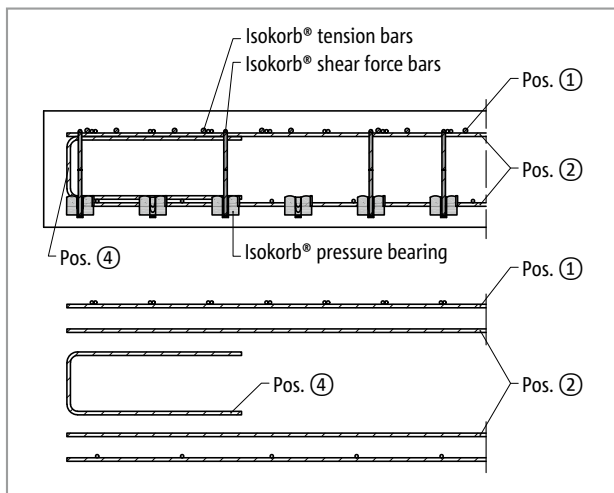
Schöck Isokorb® XT type K-M1 to M10: On-site reinforcement balcony side in section A-A; Pos. 4 = side reinforcement on the free edge perpendicular to the Schöck Isokorb®
